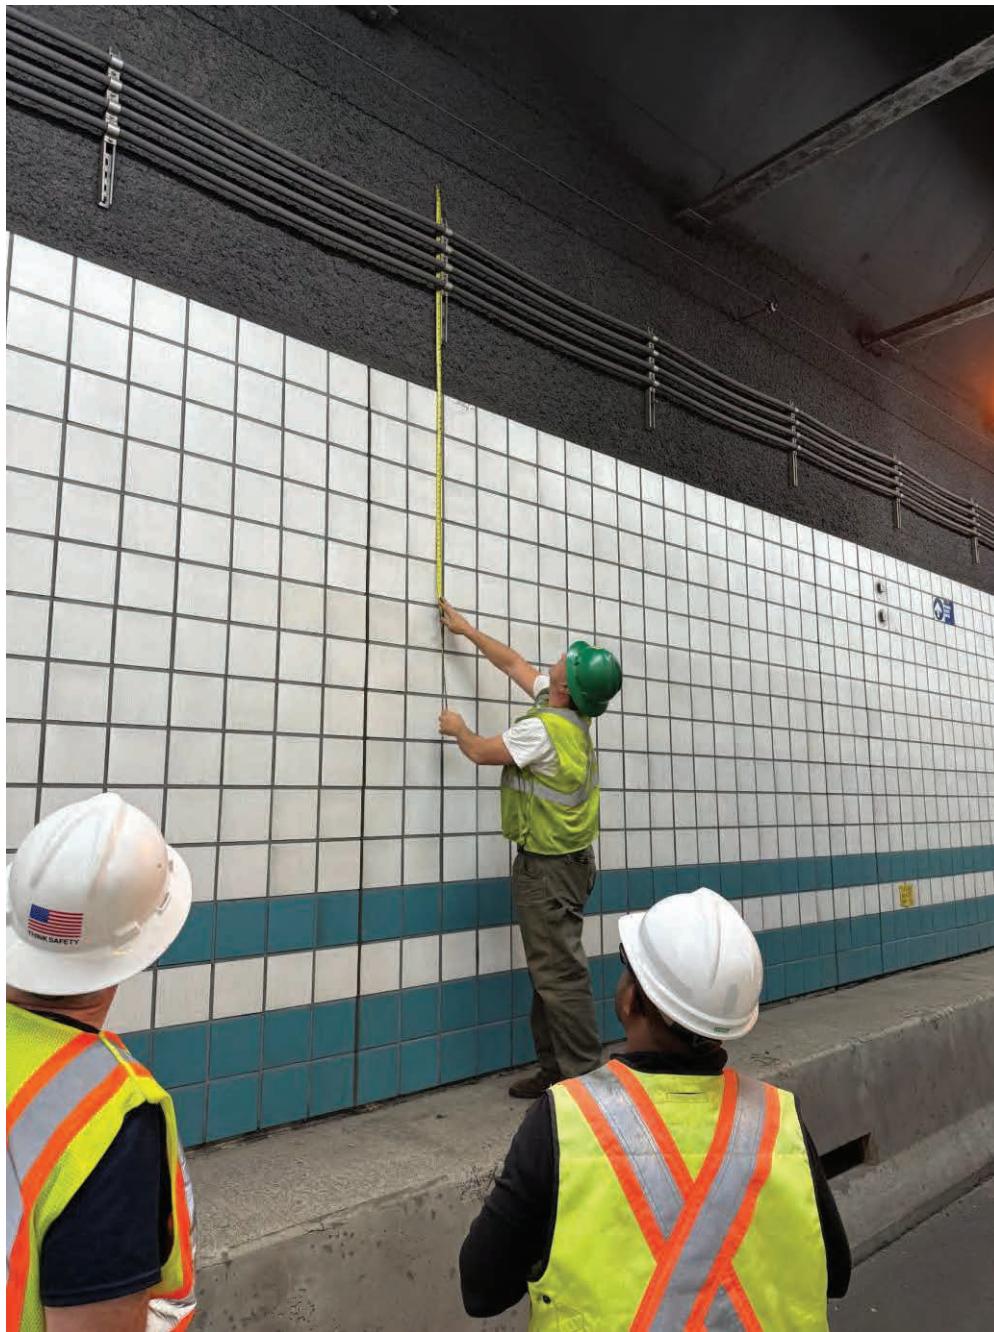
PHOTO ONE (below): Photo of installation of lighting in the I90 HOV EB Tunnel. The ongoing installation of permanent lighting, shown in left side of photo, will replace the overhead existing lighting.
